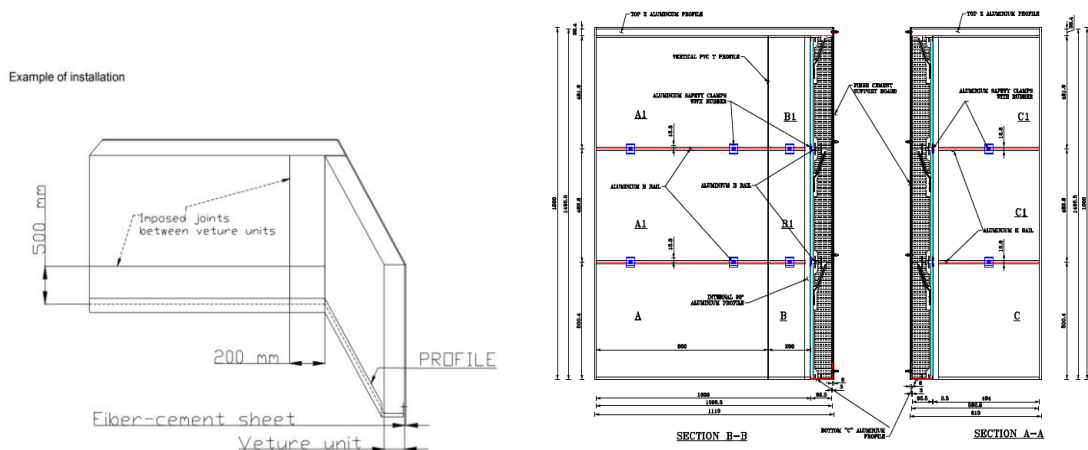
Configuration according to standard EN 13823: 2020 recommendations, example of veture kit layout
